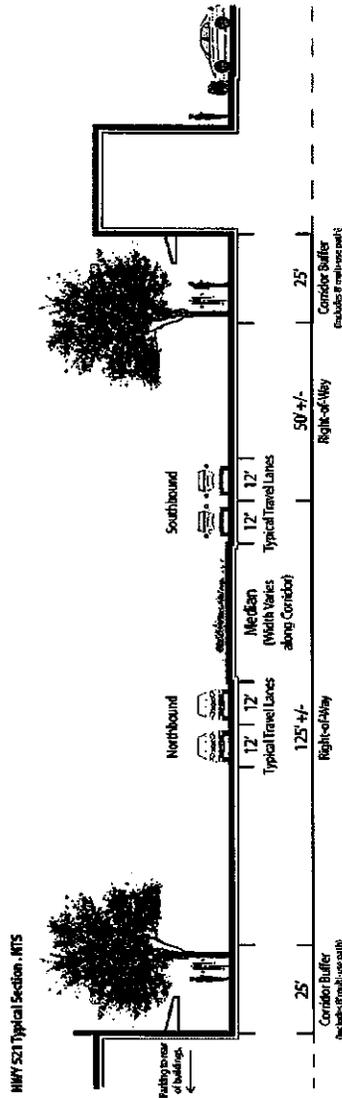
, Typical cross section along Highway Corridor Overlay District.
